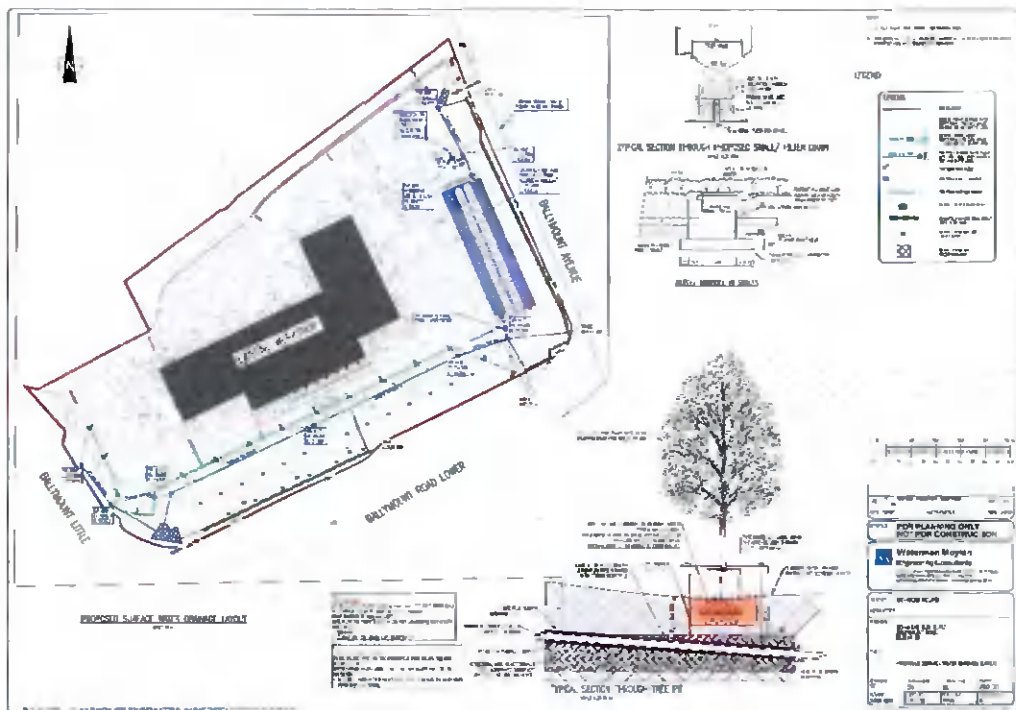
Waterman Moylan Drg No 17-130-P200A Proposed Surface Water Drainage Layout
